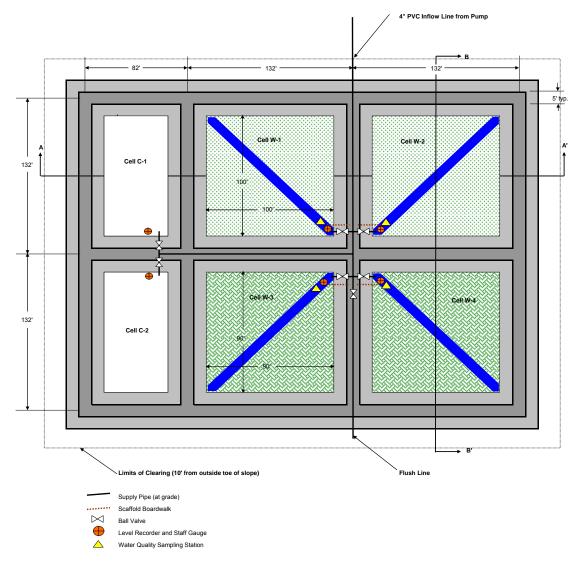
Detailed layout of the Lake Hancock Plant Establishment Study site
